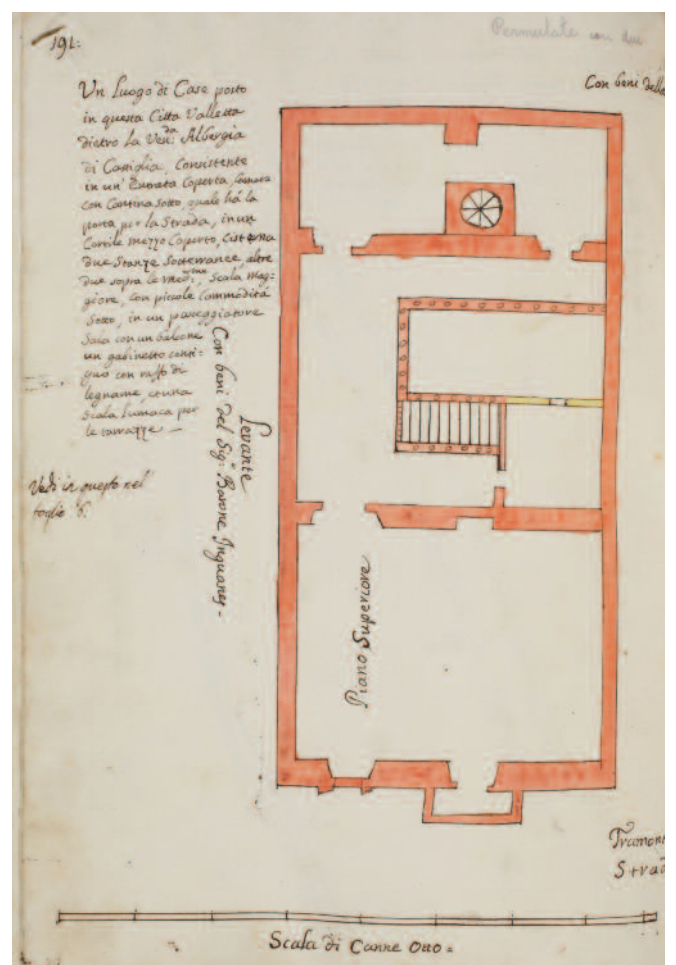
Building plan for a house near the Auberge of Castilla, 1678 (Archive of the Monastery of Santa Ursula, Valletta, ASU MS A 2, p. 191).
